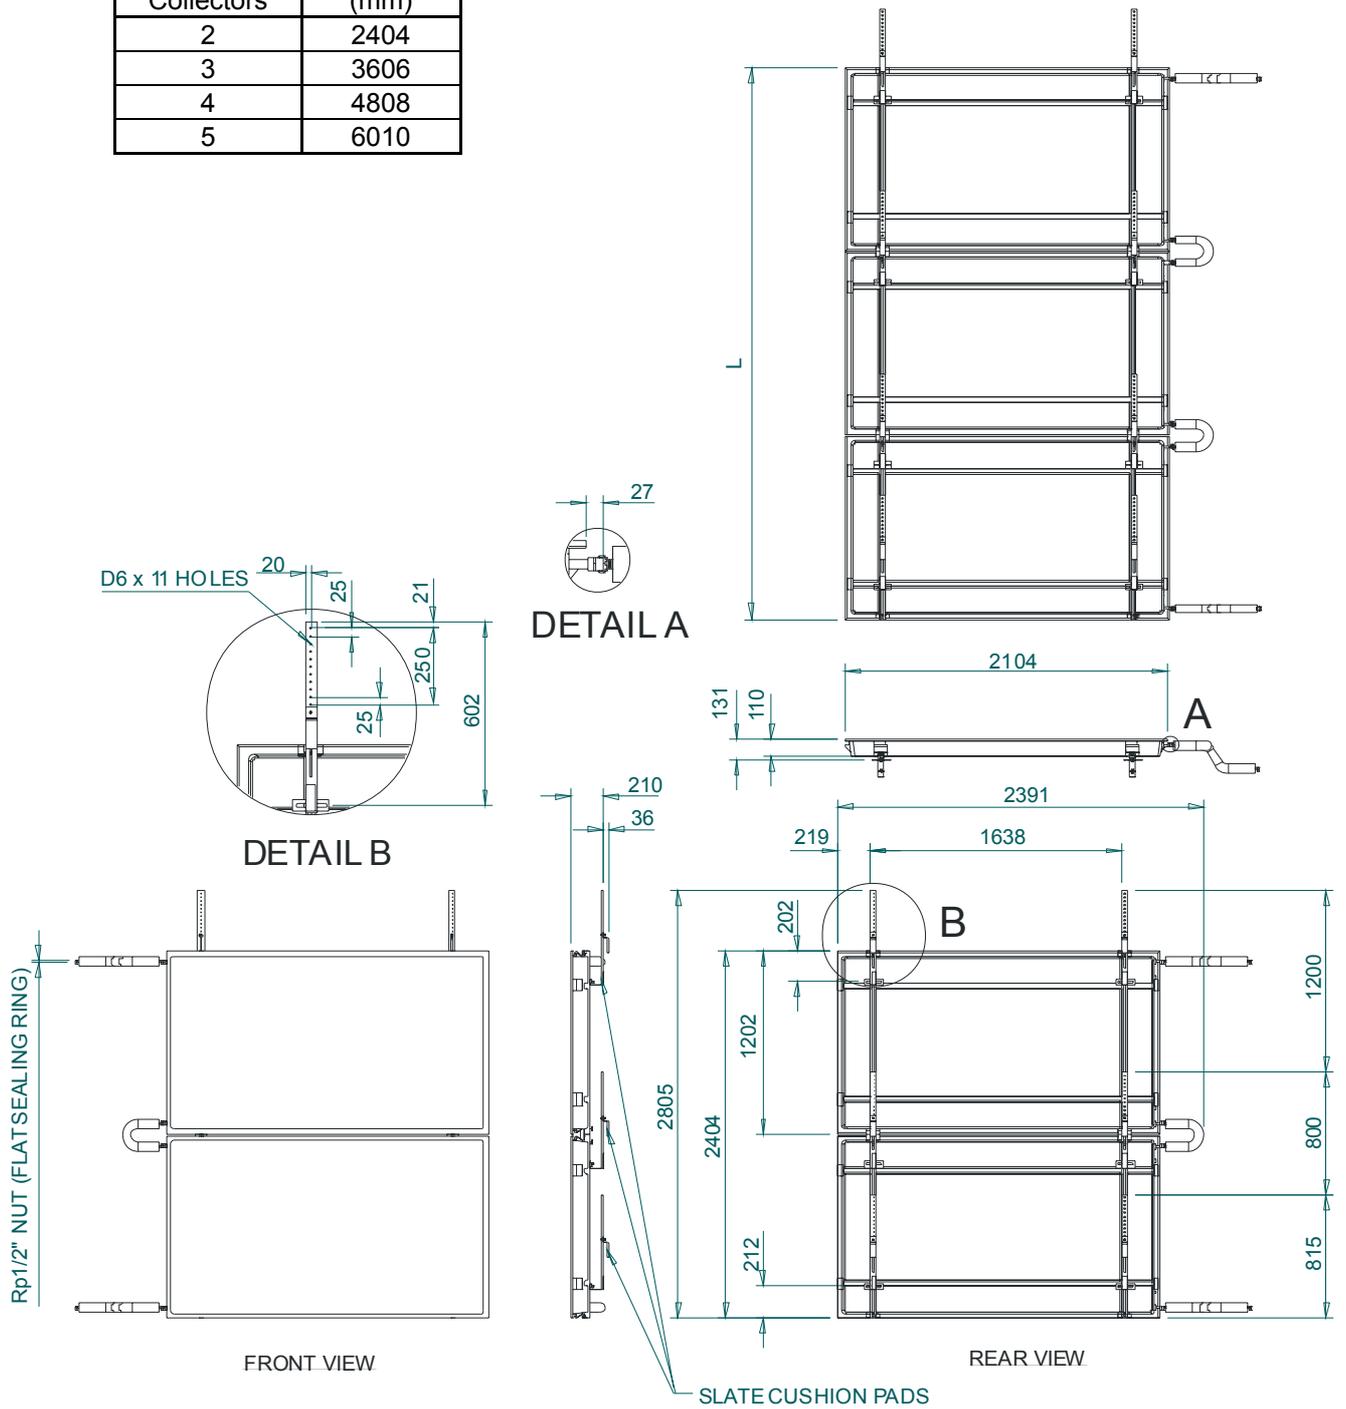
Dimensions Of On-Roof Horizontal Collector Assembly (Part No's 64300001 To 564300004)
